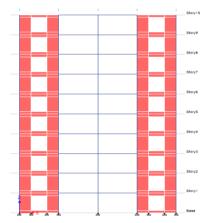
Elevation of the Frame Shear Wall Building With Vertical Opening
